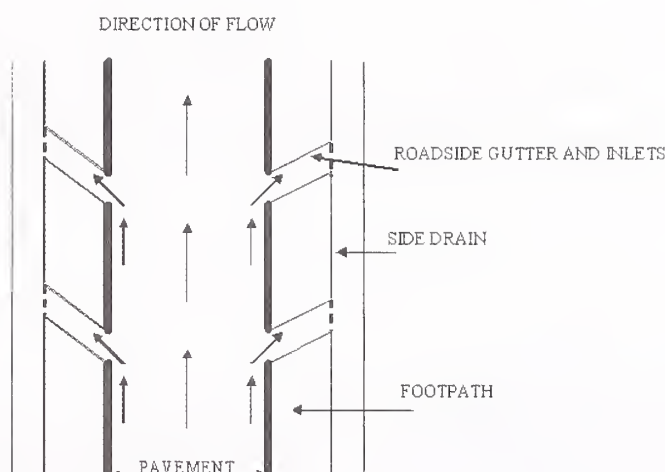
(a) Inclination of Roadside Gutter and Inlets with Respect of Flow in Pavement
